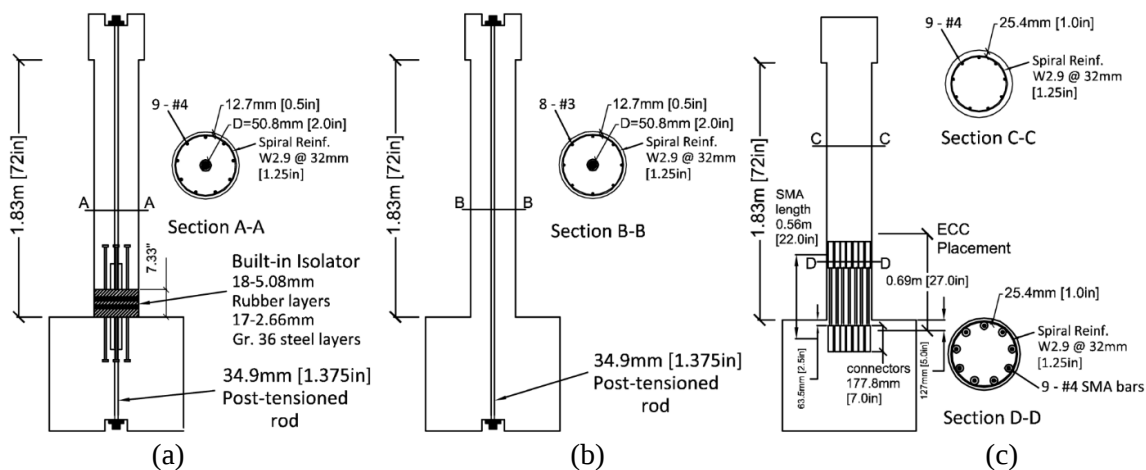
Elevation of bridge piers tested by Saiidi et al. (2010): (a) post-tensioned column with elastomeric pads, (b) post-tensioned steel-reinforced column and (c) SMA/ECC column
